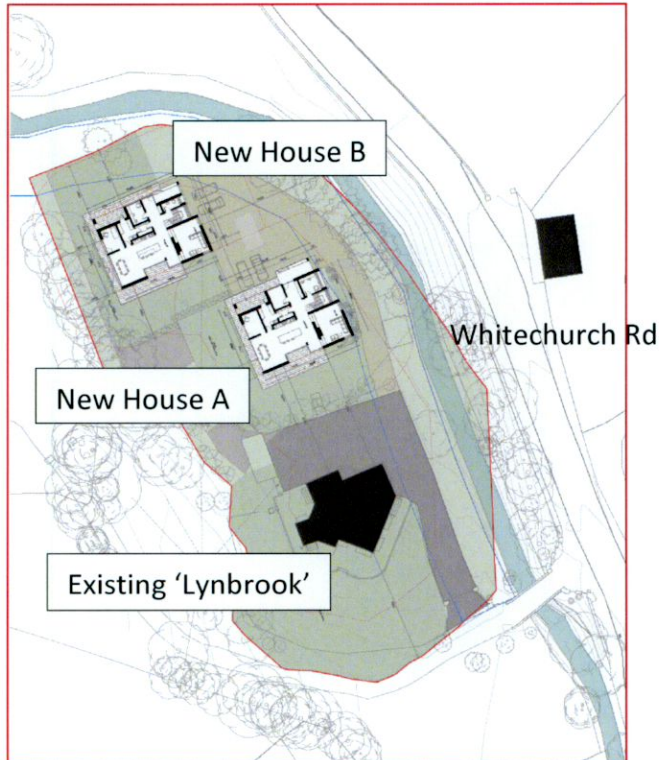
showing proposed site layout with curtilage denoted in red.
